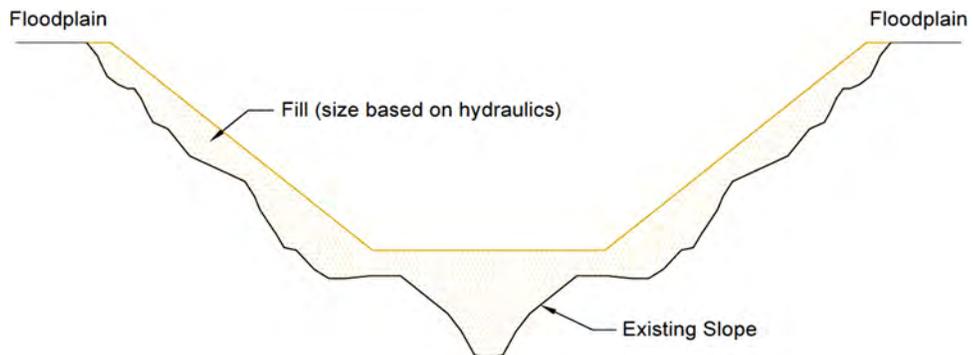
Typical Cross-Section Concept Design (Not to Scale)
